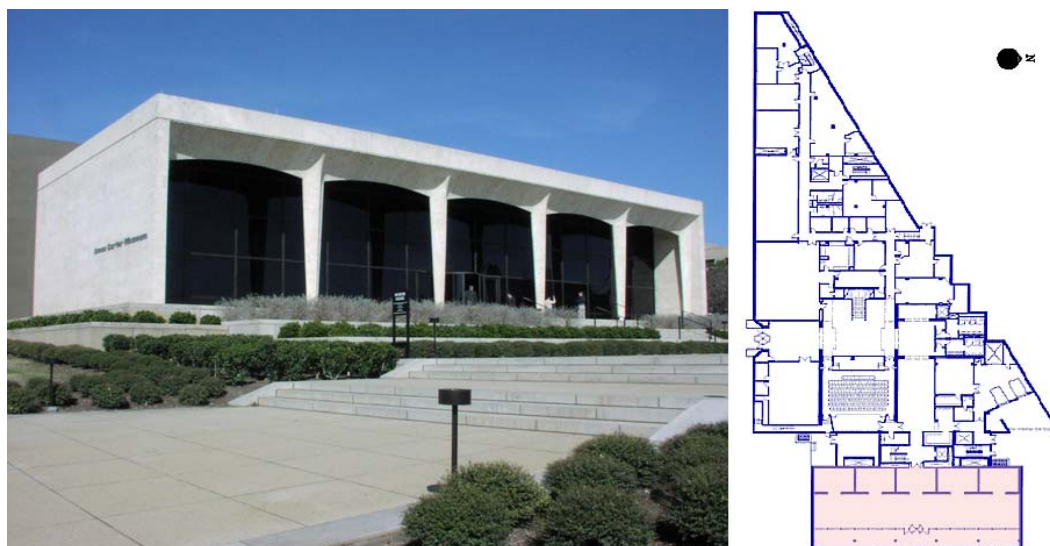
Façade of east gallery (left) and floor plan of Amon Carter Museum (right)
